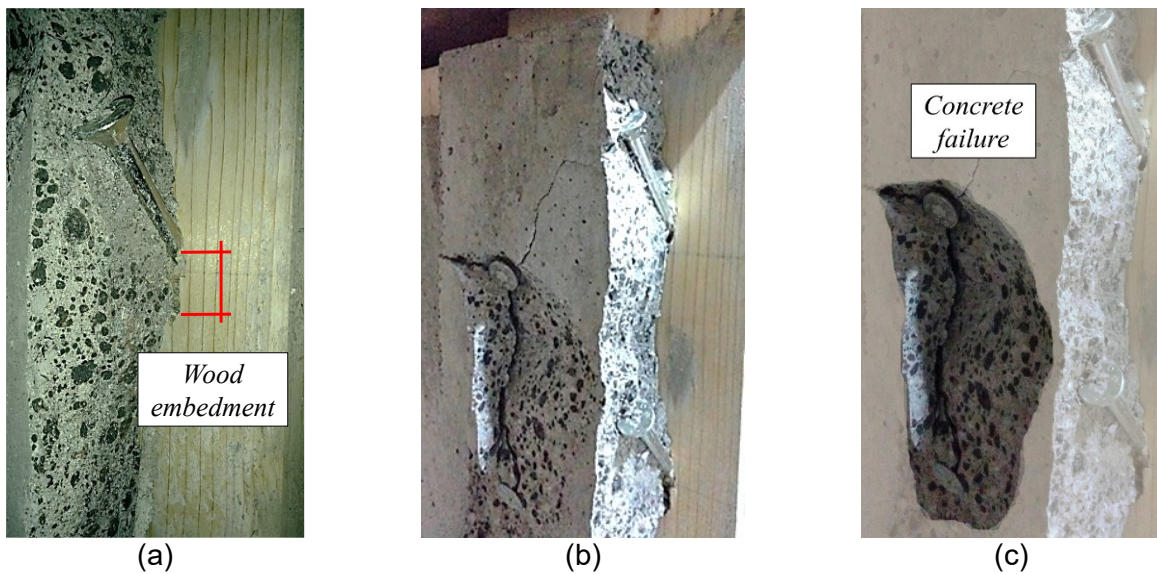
Failure mode of fasteners: (a) wood embedment for inclined screw configuration; (b) wood embedment with crossed screw configuration; (c) detail of concrete expulsion.
